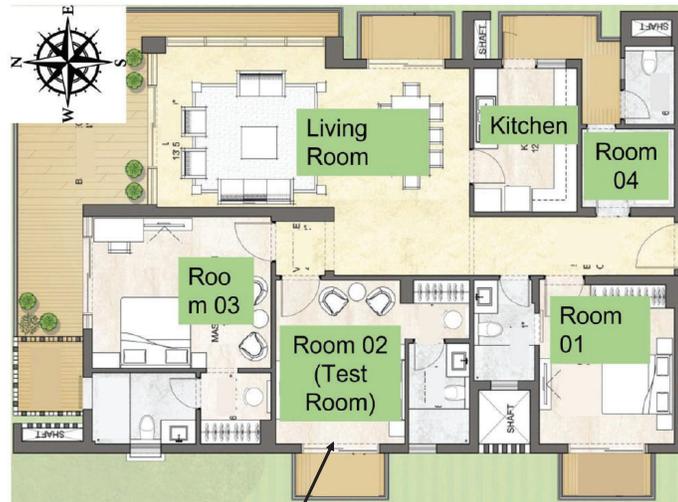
Floor plan of Unit 3 of A3 block showing test room (planned monitored space)
